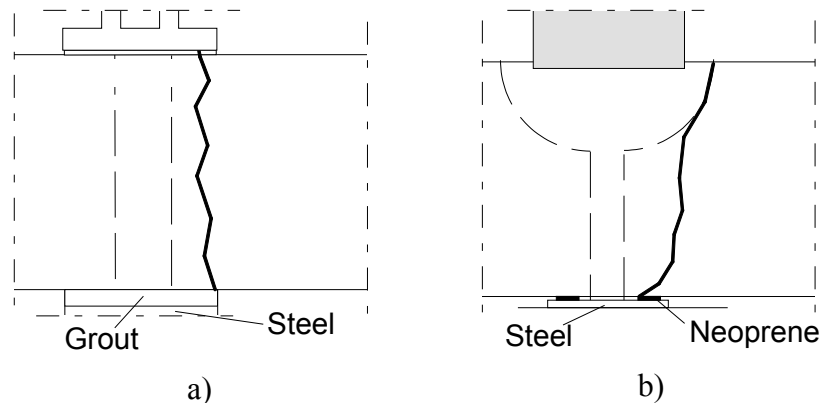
Flexural crack after failure. a) Unnotched slabs end. b) Notched slab end.
